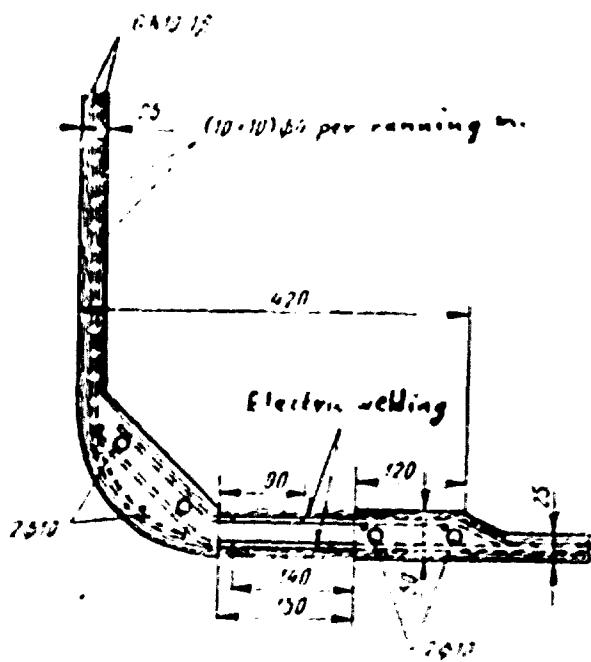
Connecting the Side Plates with the Bottom Plate.
